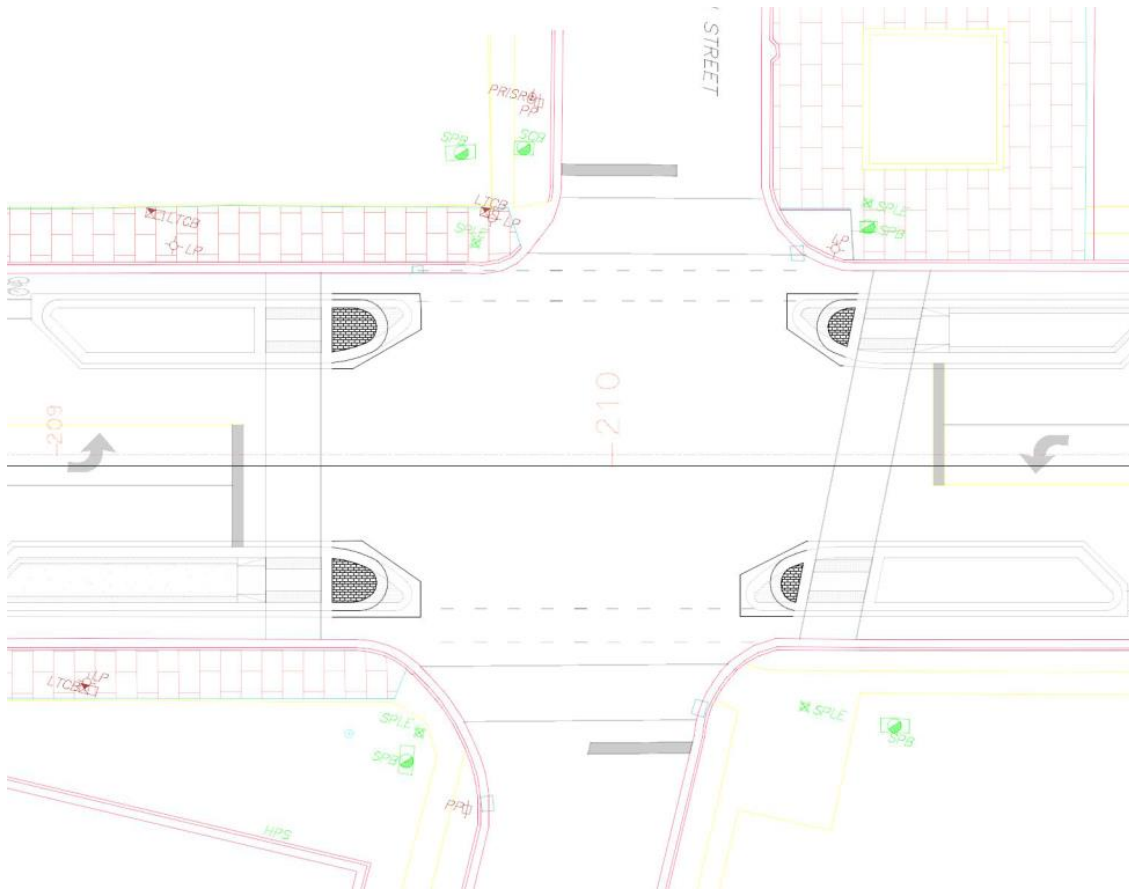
Proposed modification to curb island noses at Armour Road and Iron Street
